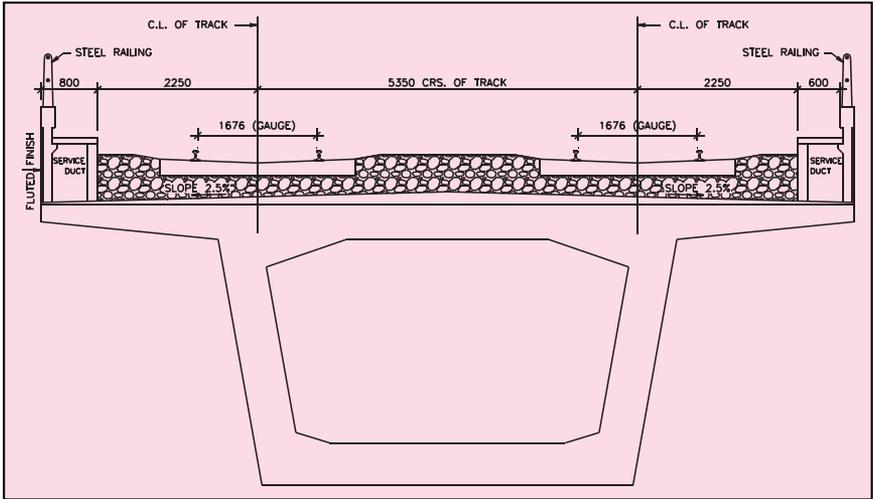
Typical Cross section of PSC box girder spans 30m to 45m (for both tracks)
